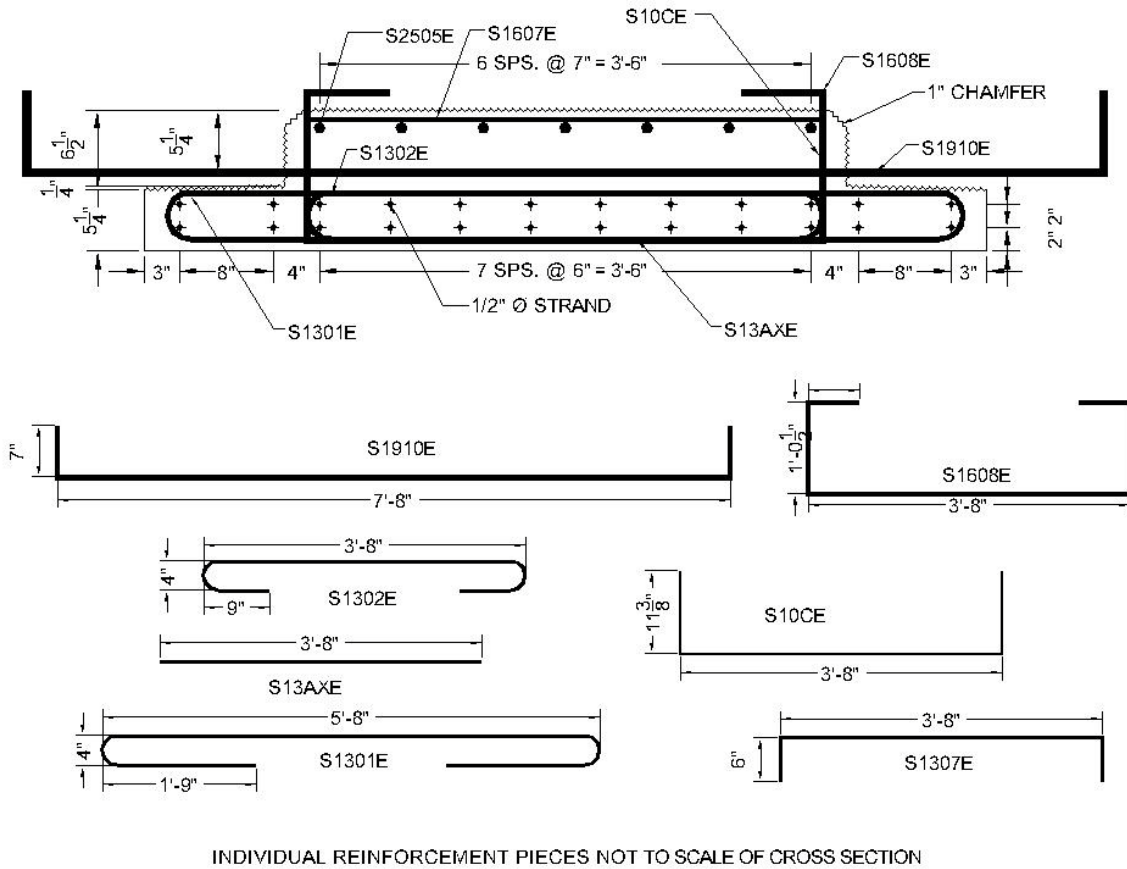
Cross section and individual reinforcement details for west end of precast beam 2N
